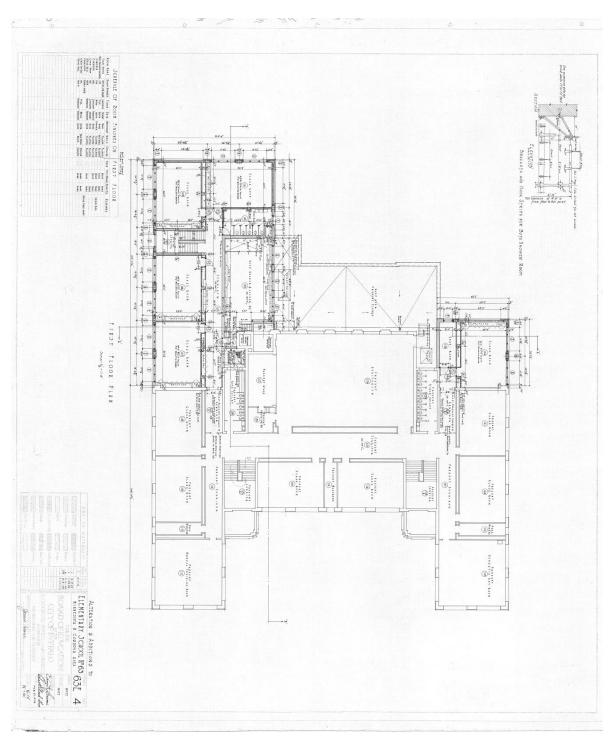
First Floor Plan, School No. 63 Addition, Associate Buffalo Architects, Inc. 1925.
